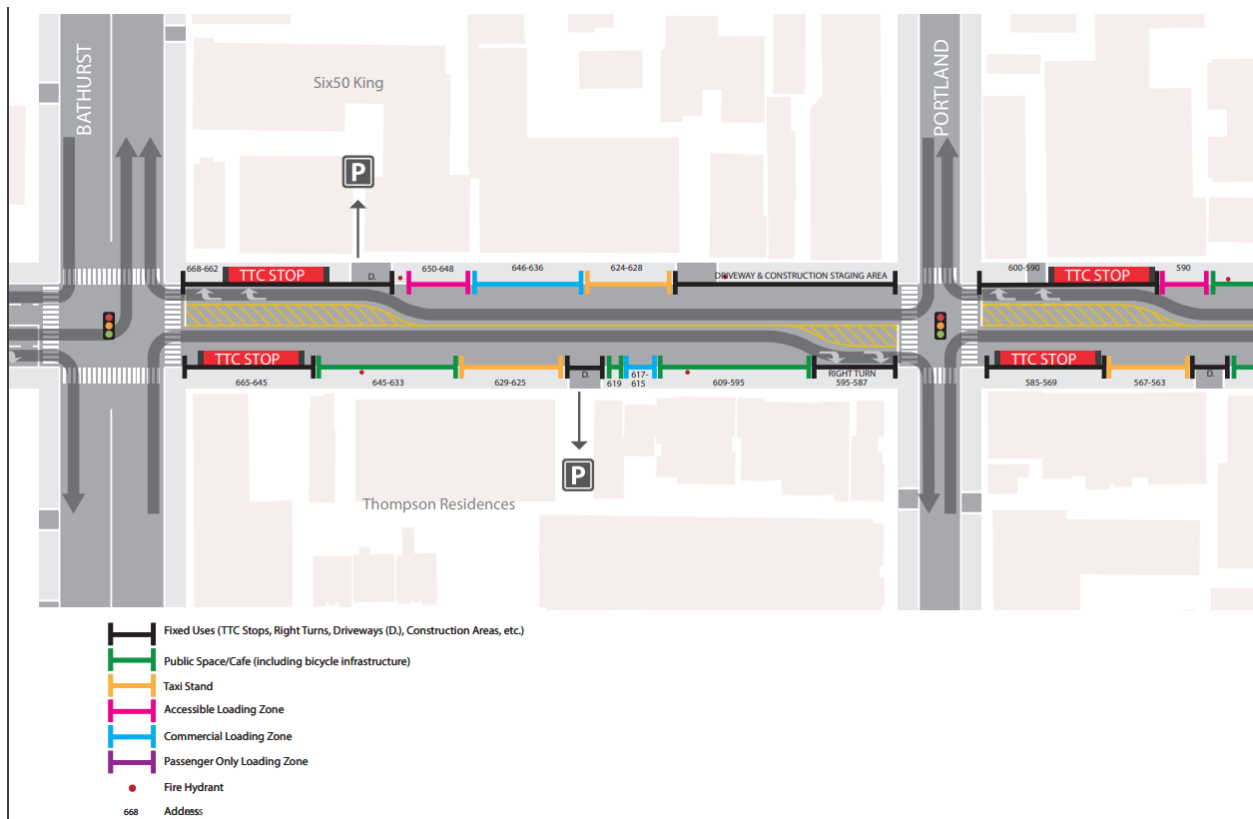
Typical Street Configuration for King Street Transit Priority Corridor
